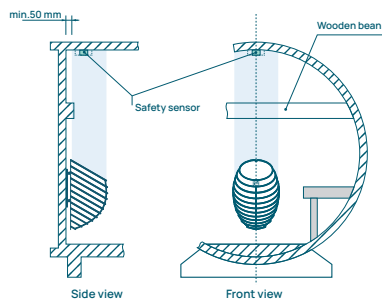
Installing the safety sensor on the ceiling in barrel saunas: wall-mounted heater
